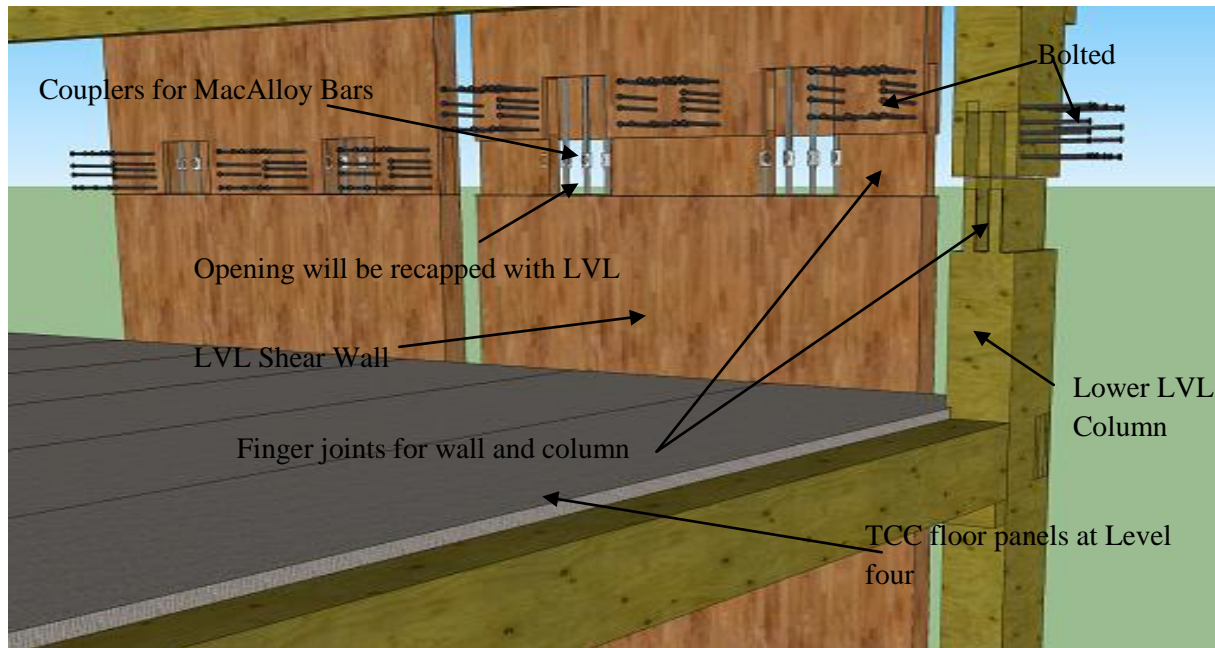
Splicing details for walls and columns members at mid height of Level 4.
